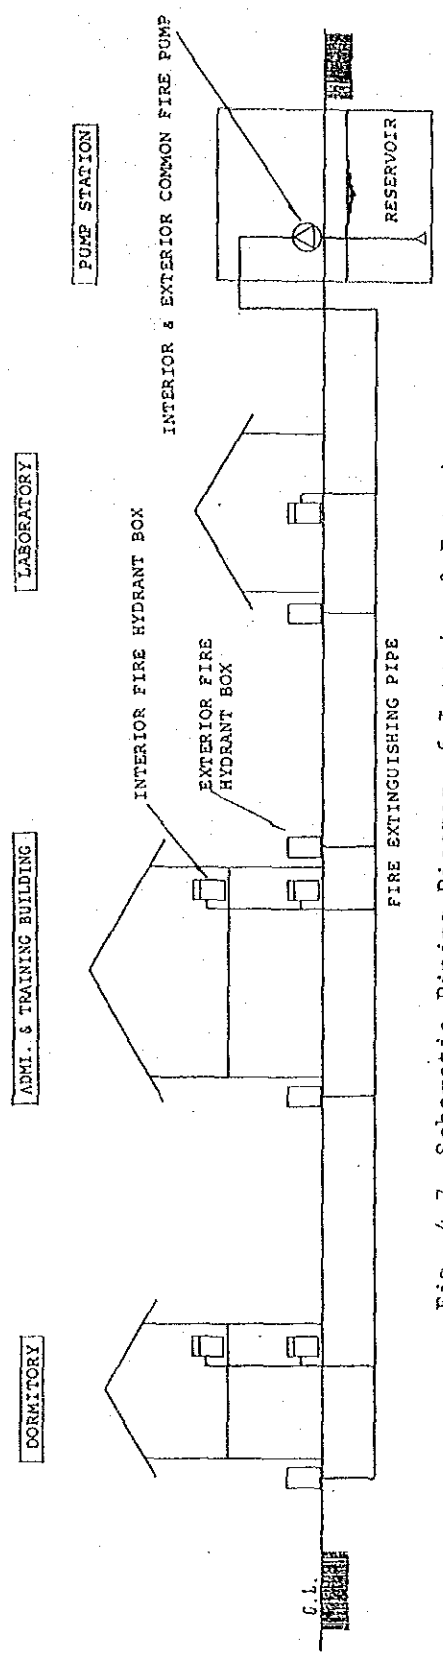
Schematic Piping Diagram of Interior & Exterior Fire Extinguishing System
